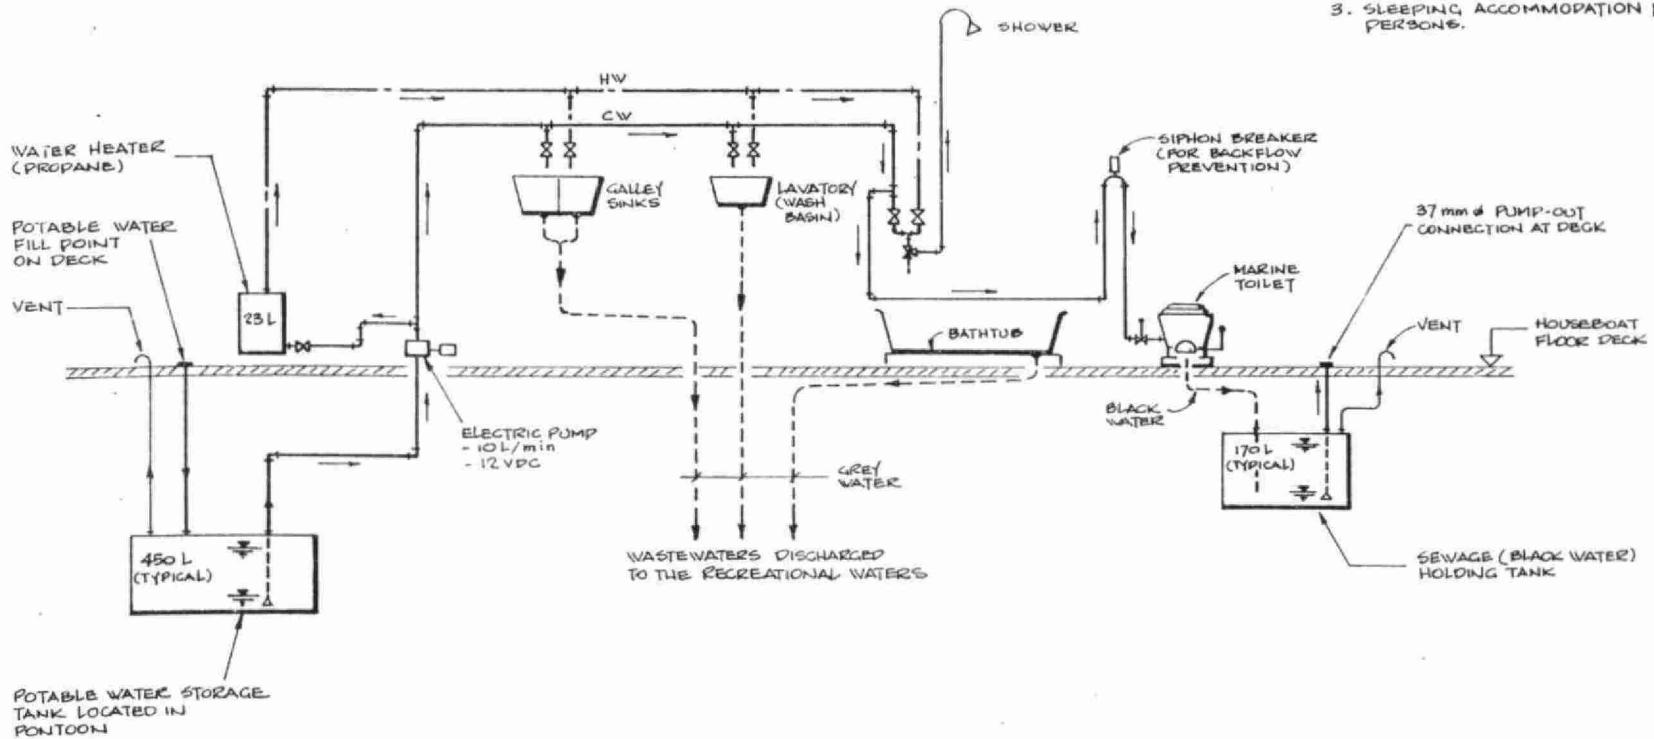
TYPICAL SMALLER HOUSEBOAT PLUMBING SYSTEM
